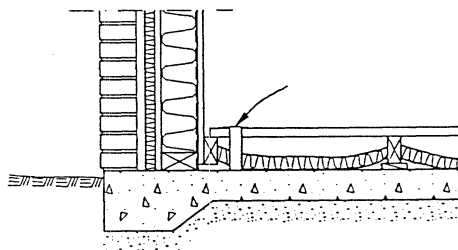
Building with a ventilated joist floor construction on a concrete slab.
